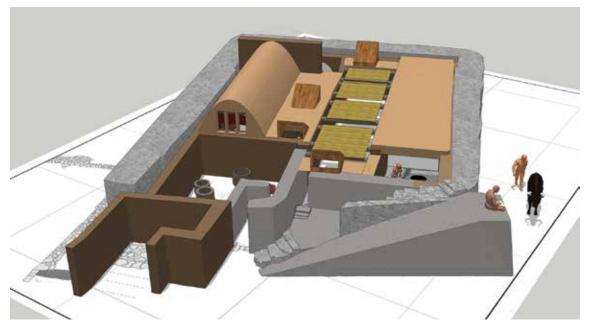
A 3D model showing possible roofing over ES2, including a leaning vault over the "reception hall"
